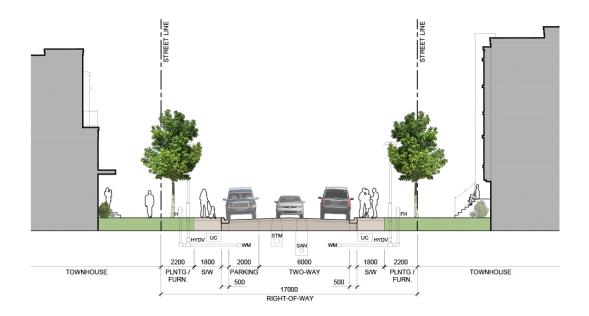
J 'C' Streets support a pedestrian-scale environment and can also provide secondary side or rear street access.
